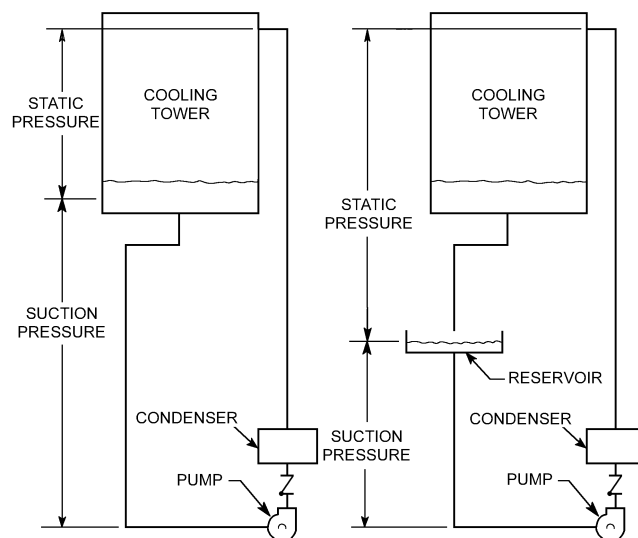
Schematic Piping Layout Showing Static and Suction Head
